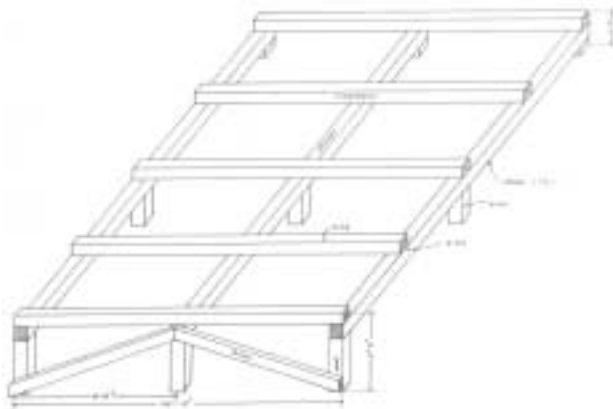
Pile foundation constructed of posts, stringers, and crossbeams. (Source: *Air Drying of Englemann Spruce, FPL Report R1944-5*)
